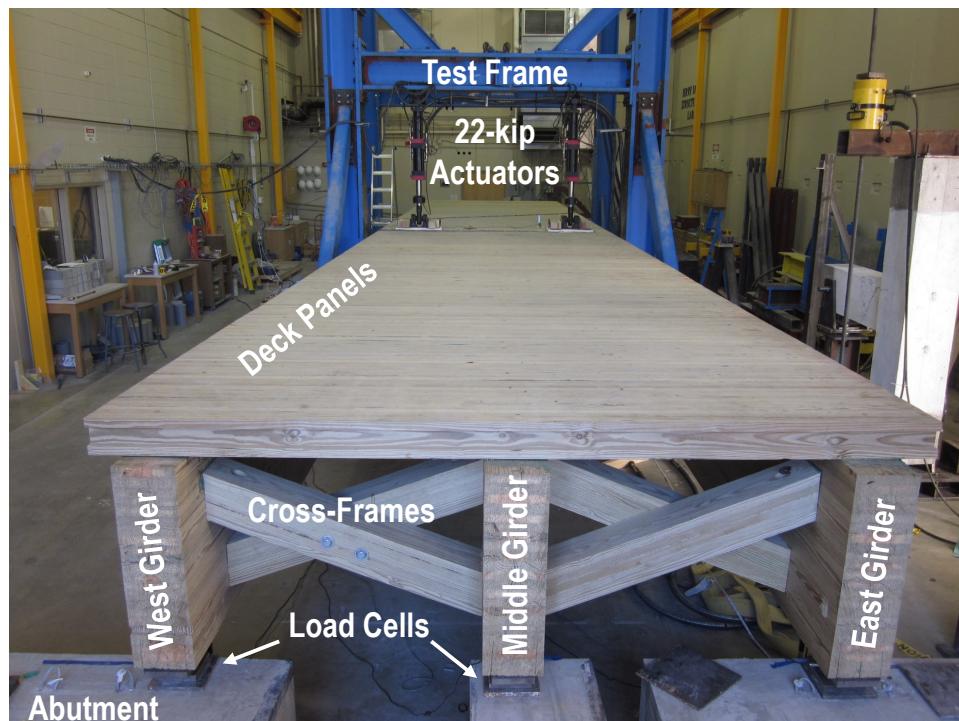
Fatigue Test Setup for Timber Girder Bridge
